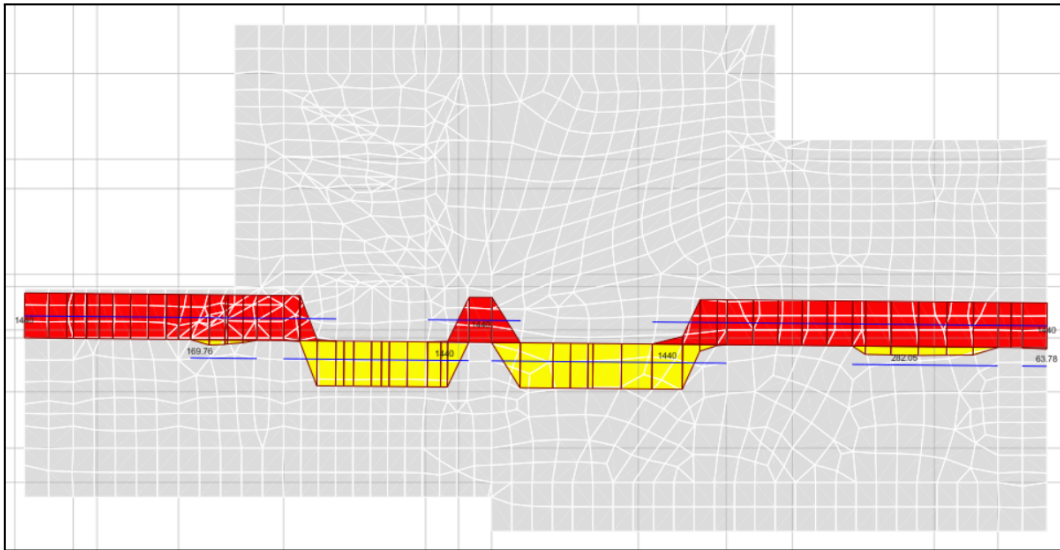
Flexural reinforcement of mat foundation in direction 1; X-direction
